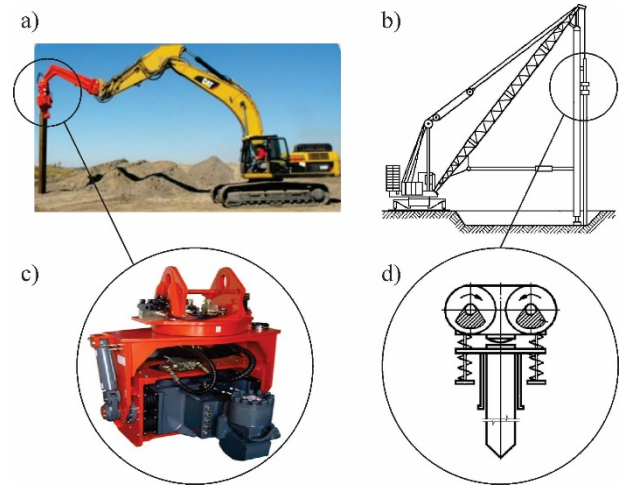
Vibratory Hammer: a) Driving sheet pile 400mm x 6m[41], b) Shema of machine driving sheet pile/beam/pipes [6], c) Sheet pile driver [41], d) Sheet pile driver - Shema [6].
